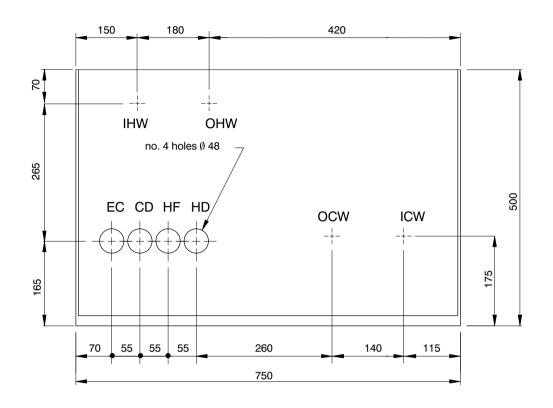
p Water and electrical connections Liebert HPM S06C - Plan view
